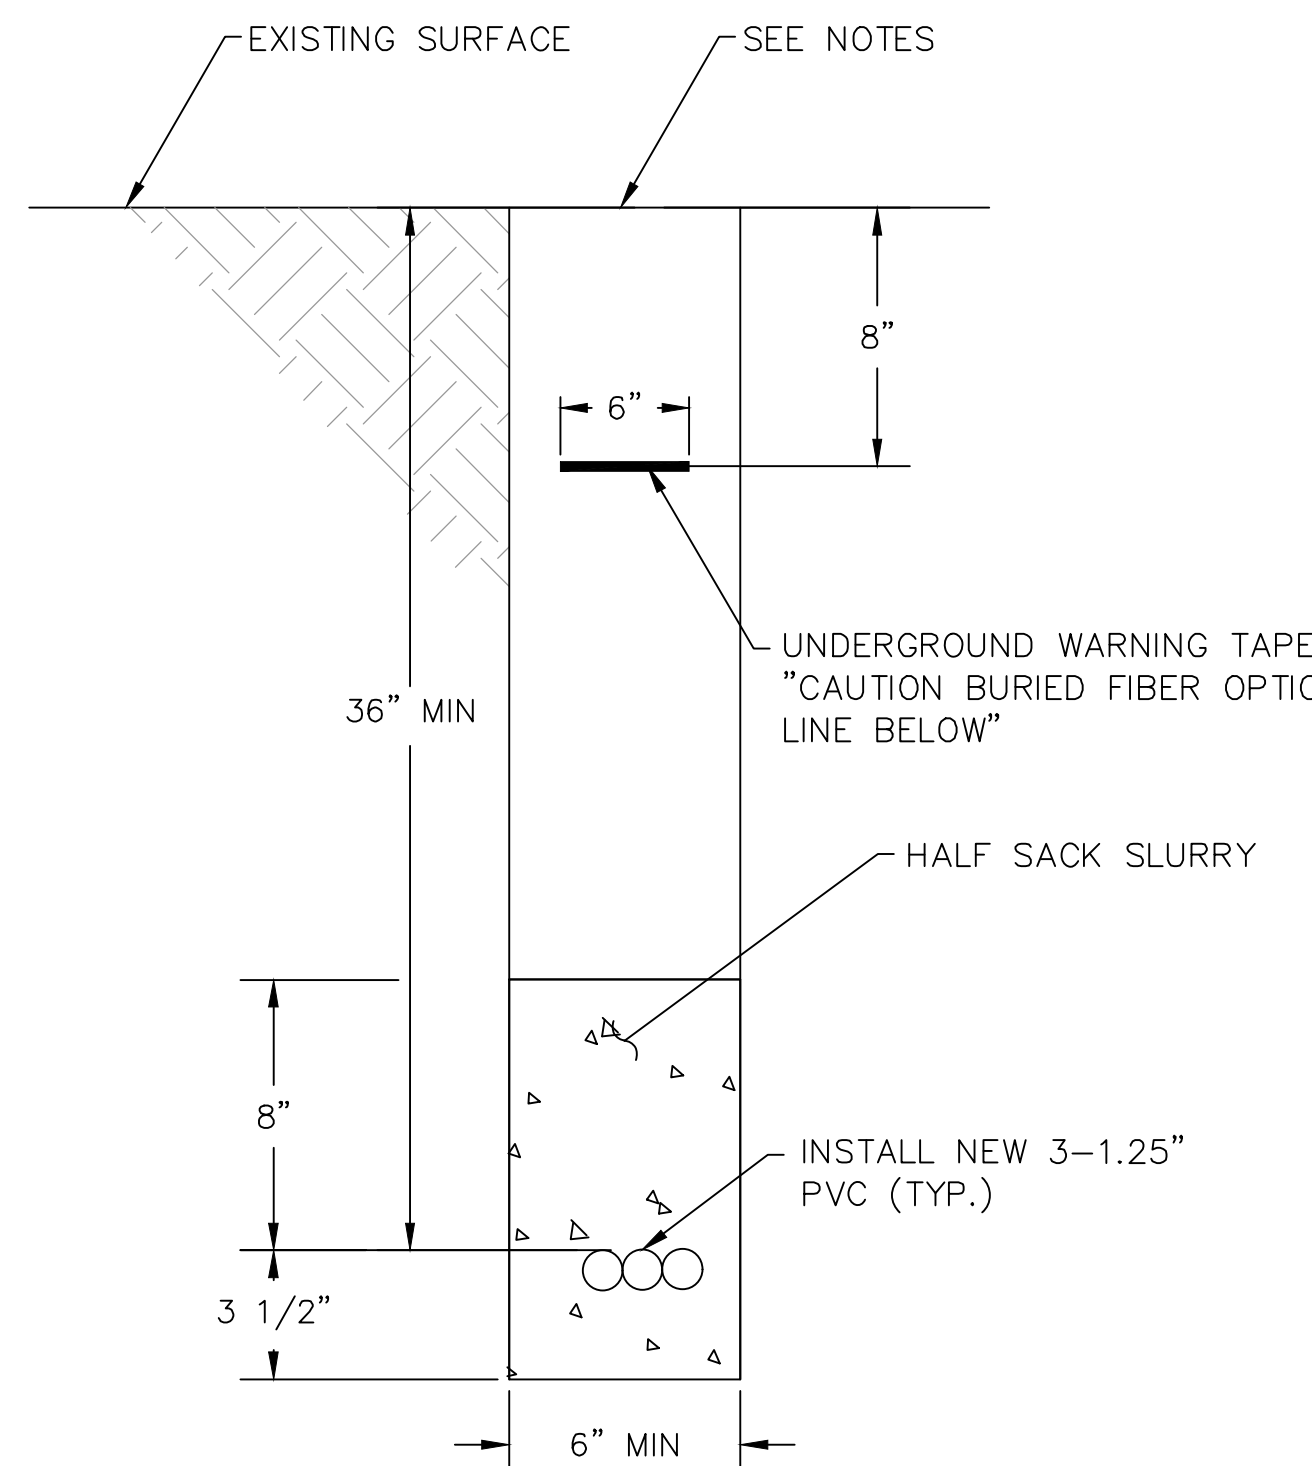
DETAIL C (FOR OPEN TRENCH INSTALLATION OF ONE NEW CONDUIT)
